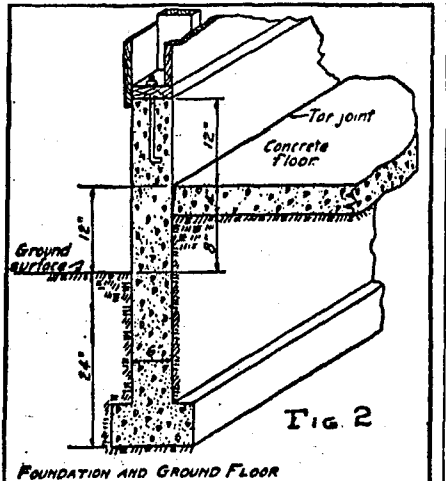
Showing a Good Method of Making Foundation and Floor of a New Building Ratproof.
